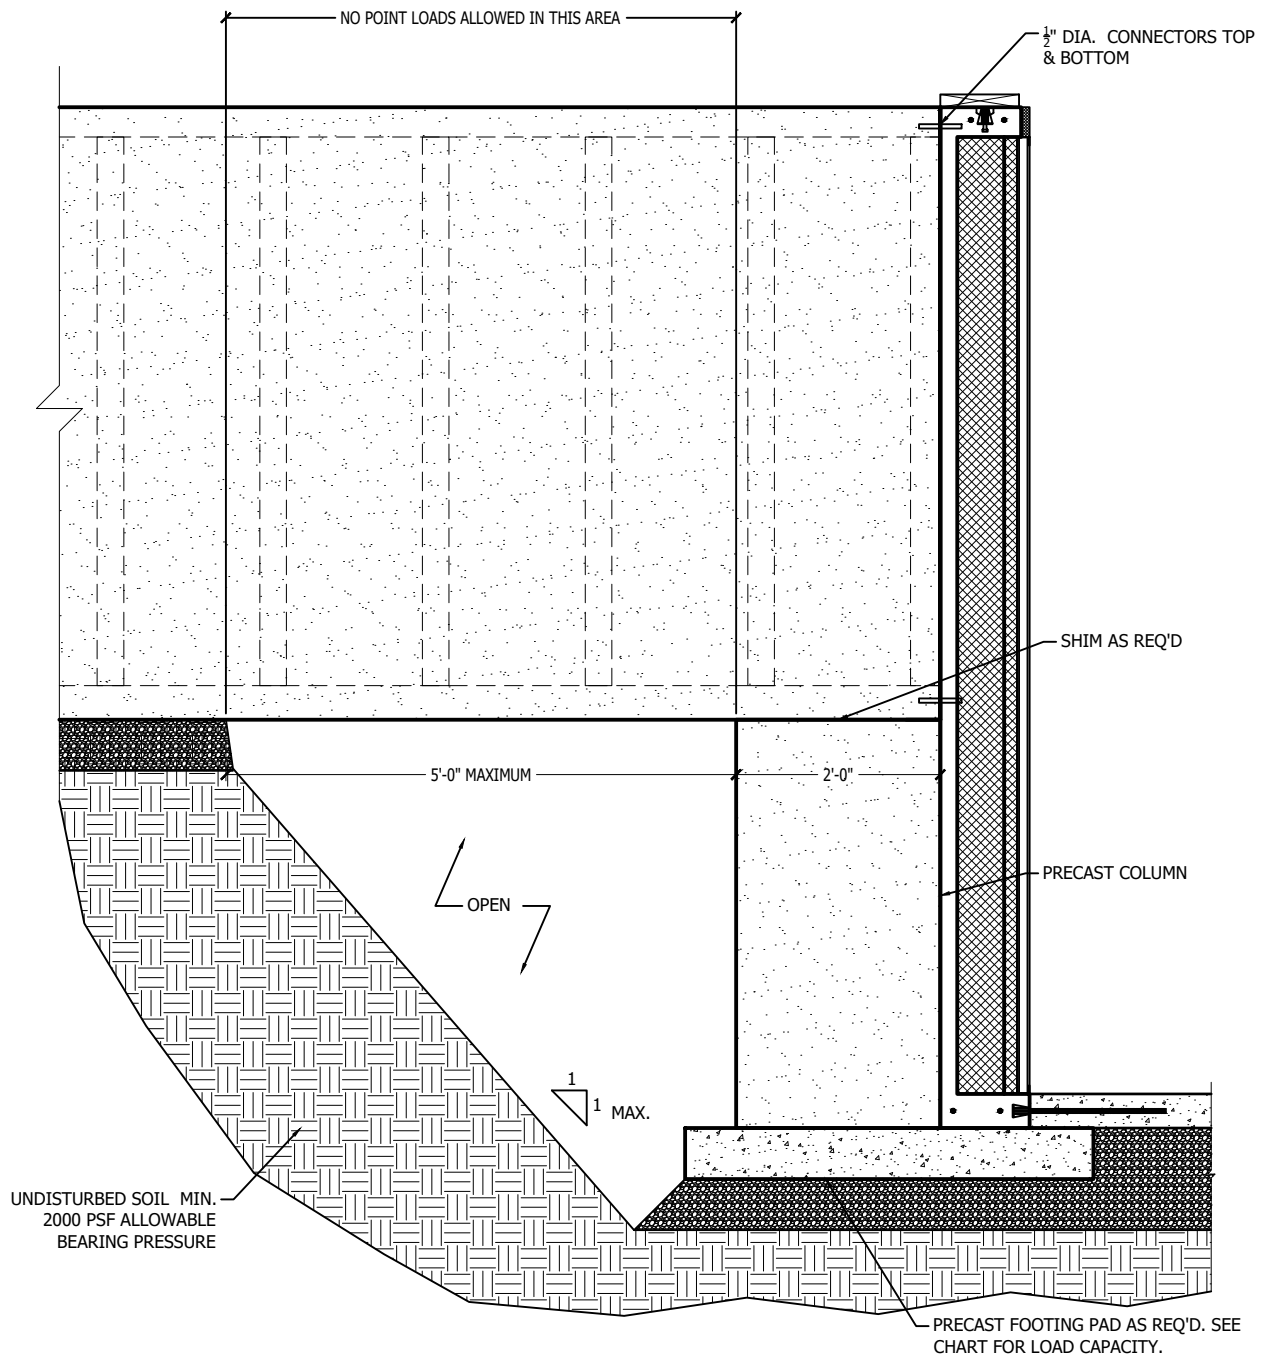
CRAWL WALL TO BASEMENT WALL PERPENDICULAR
